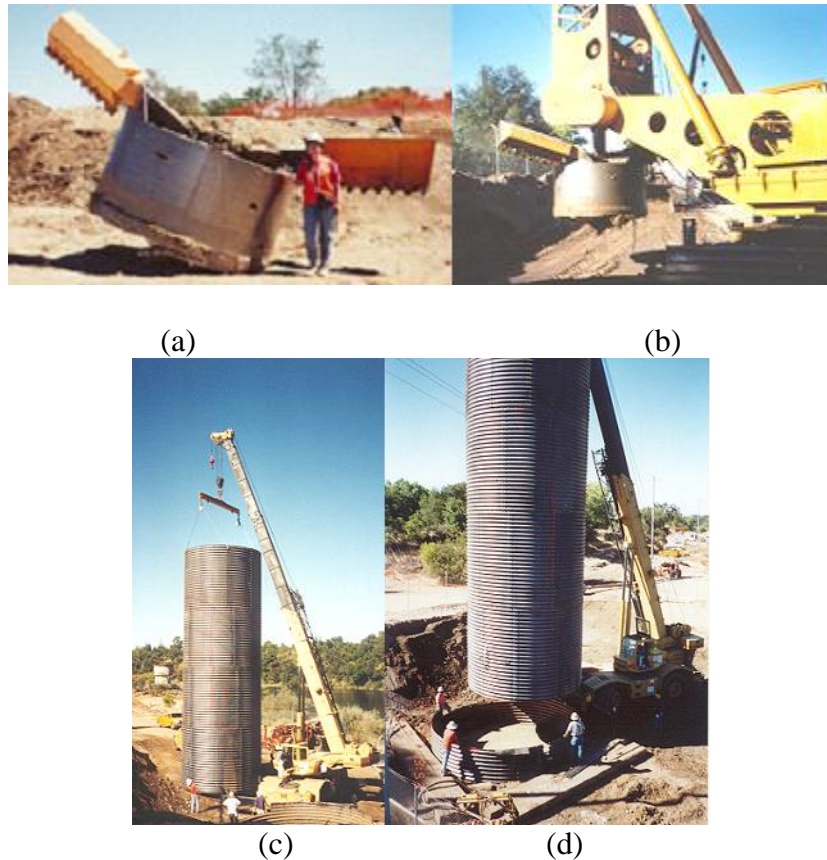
Auger Drilled Shaft on North Side of Snohomish River a) Auger with Reaming Wings b) Auger with Reaming Wings Connected to Drill c) Crane Lifting Full Section of Inner Casing d) Setting Inner Casing in Polymer-Filled Drilled Shaft.
